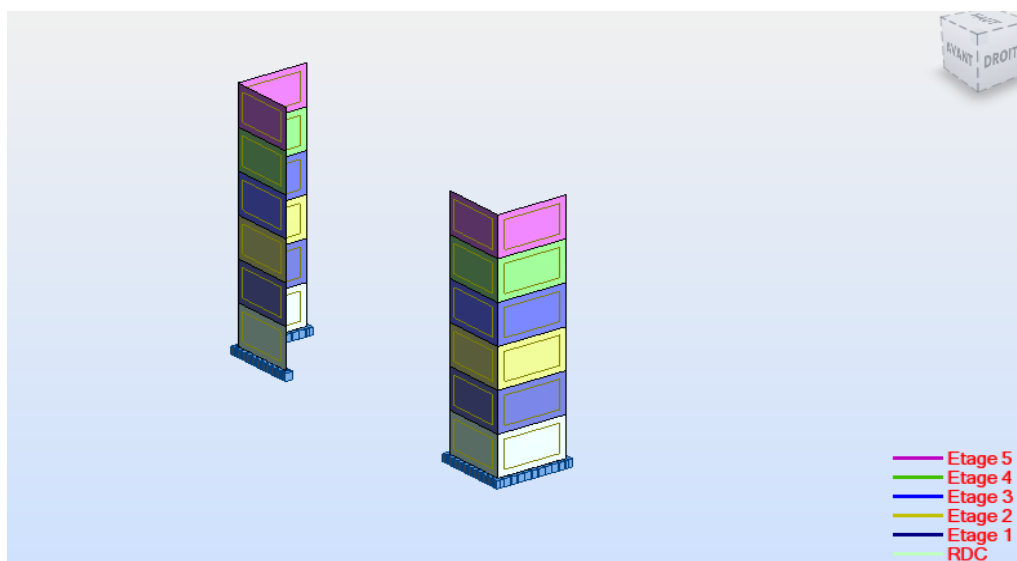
Asymmetrical arrangement of shear walls should be avoided.
